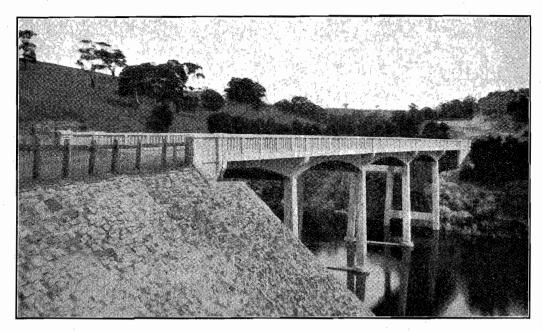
Western Highway. Bridge at Pyke's Creek Reservoir.
